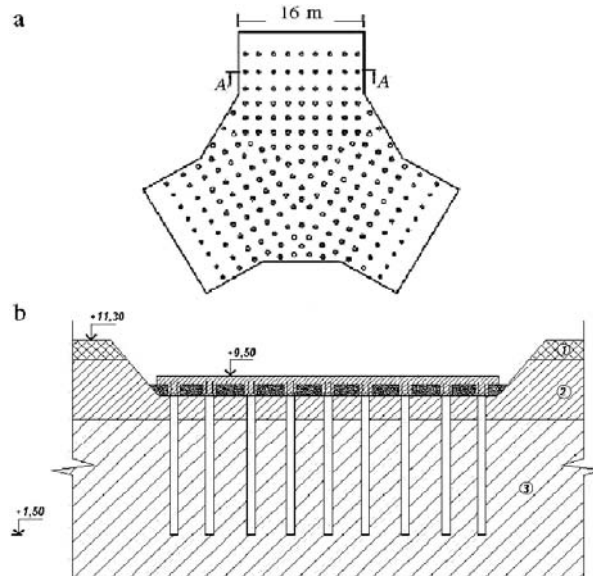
The plan of plate grillage, pile field (a) and A-A cross-section(b)
